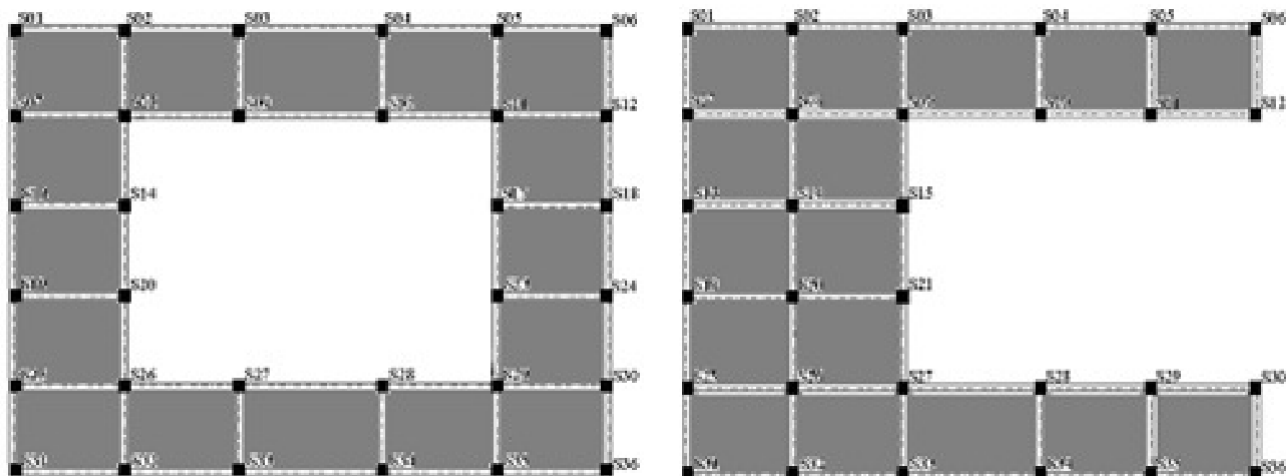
The storey plans and gaps of B6 and B7 buildings.
